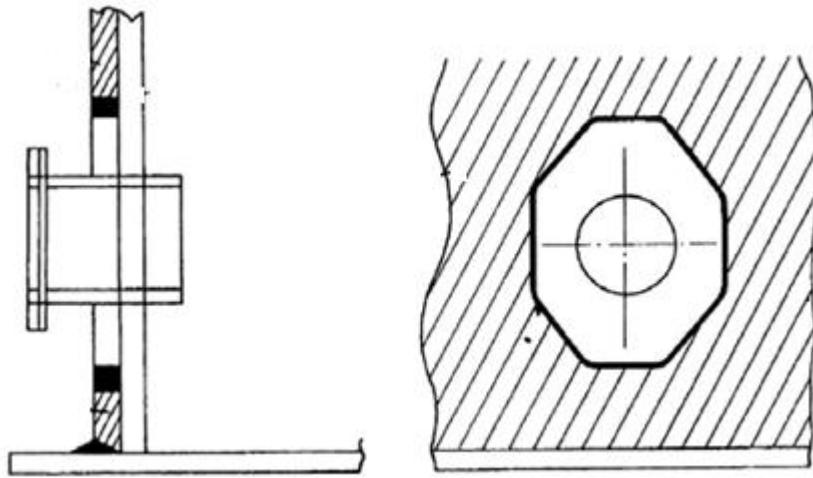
Shell plate reinforcement using additional plate around manhole, nozzle and visit gate
